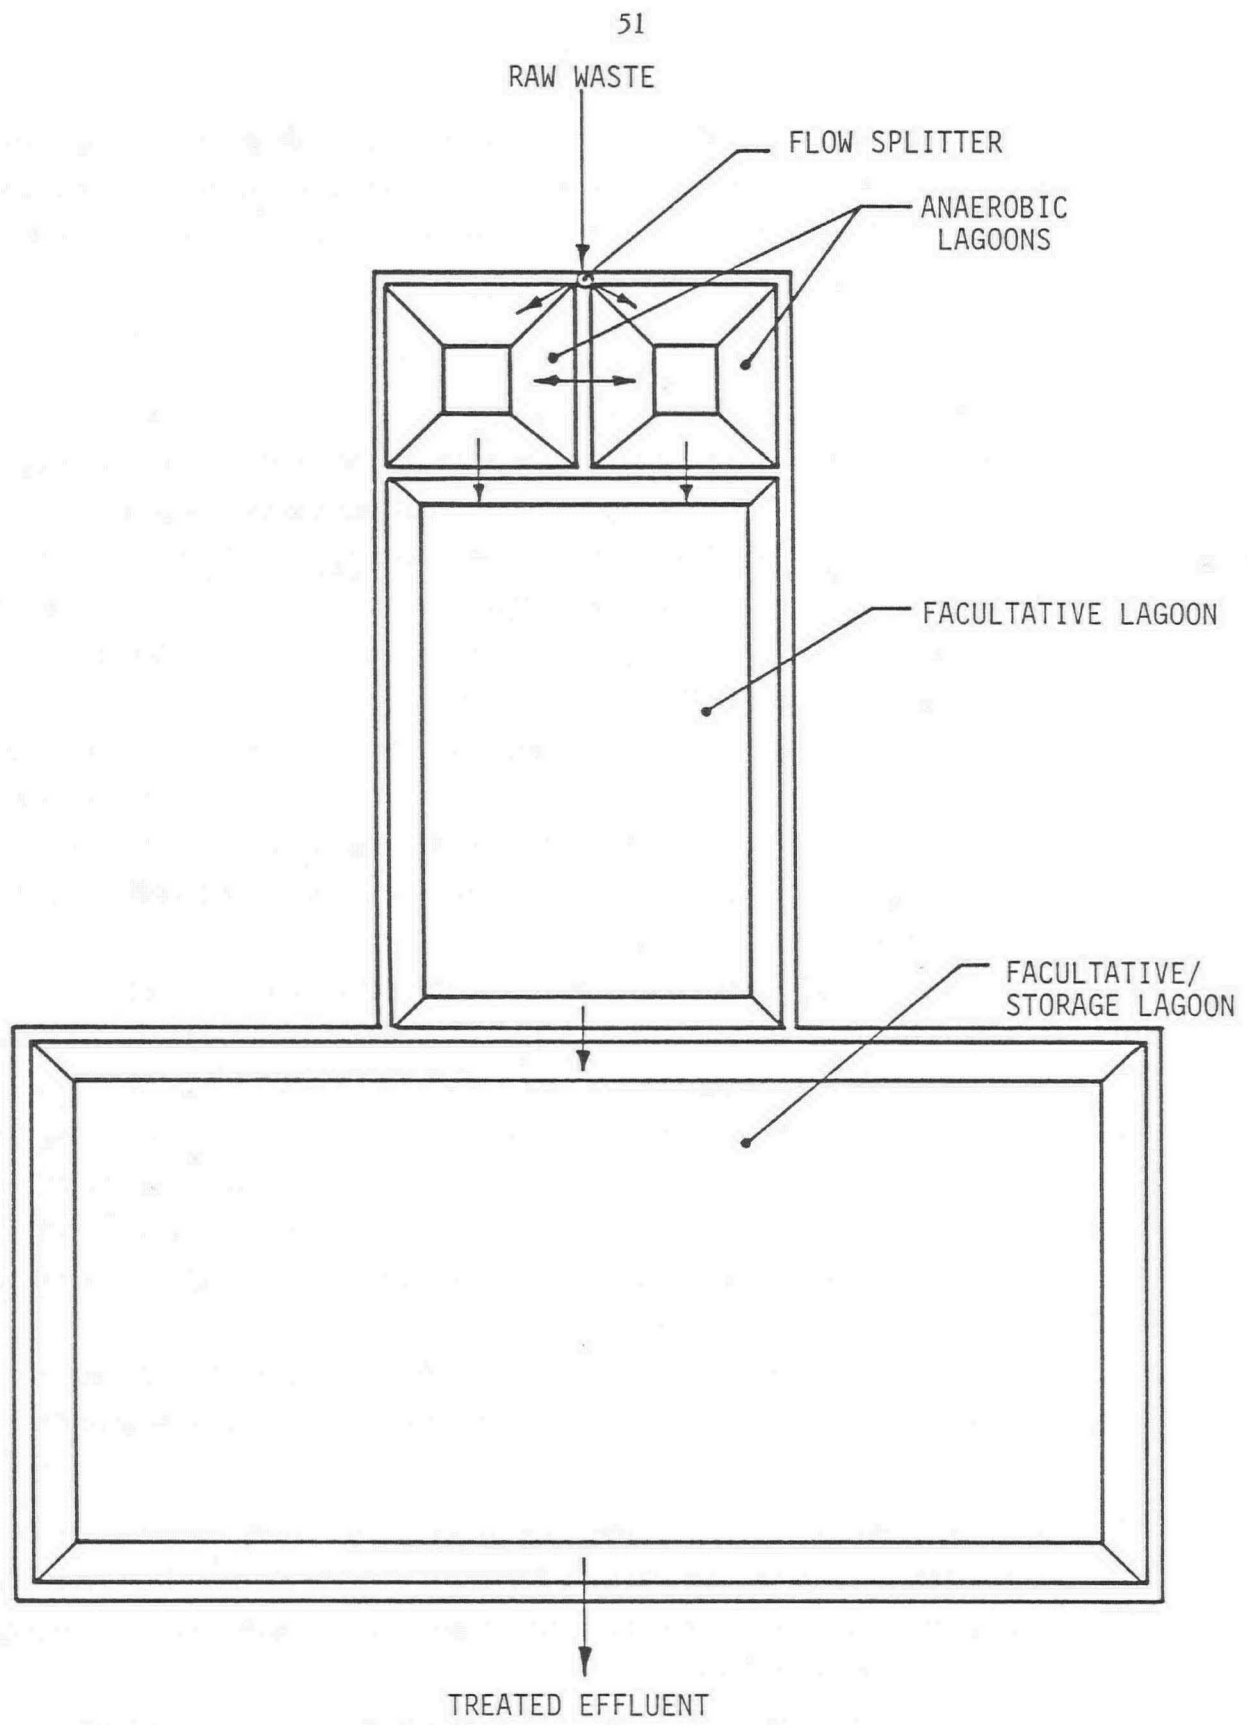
LAYOUT OF A TYPICAL LAGOON SYSTEM
